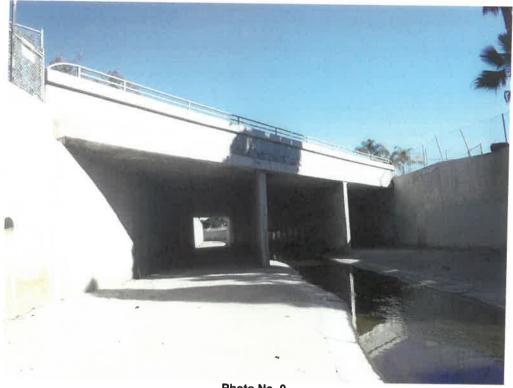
SIDE VIEW LOOKING NORTHEAST
